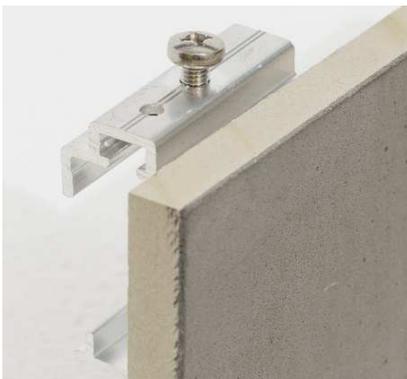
detail of CIMENTO® finish in correspondence of the anchor.
